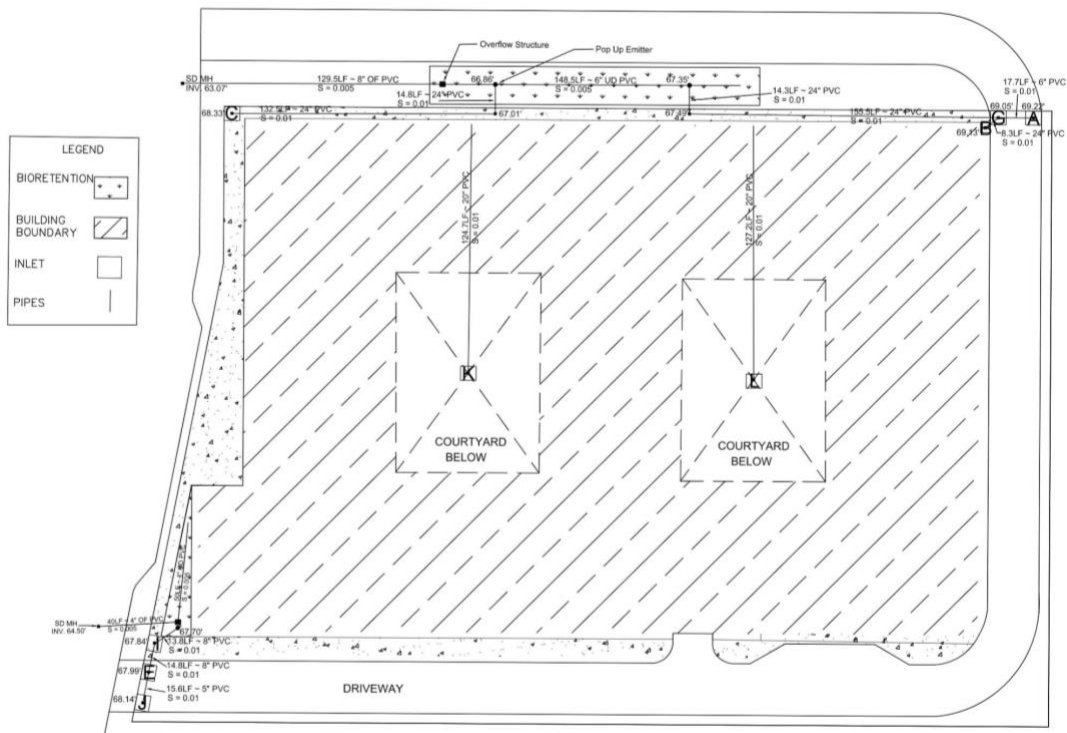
Final site layout including details of stormwater management components. See Appendix B for a larger drawing.
